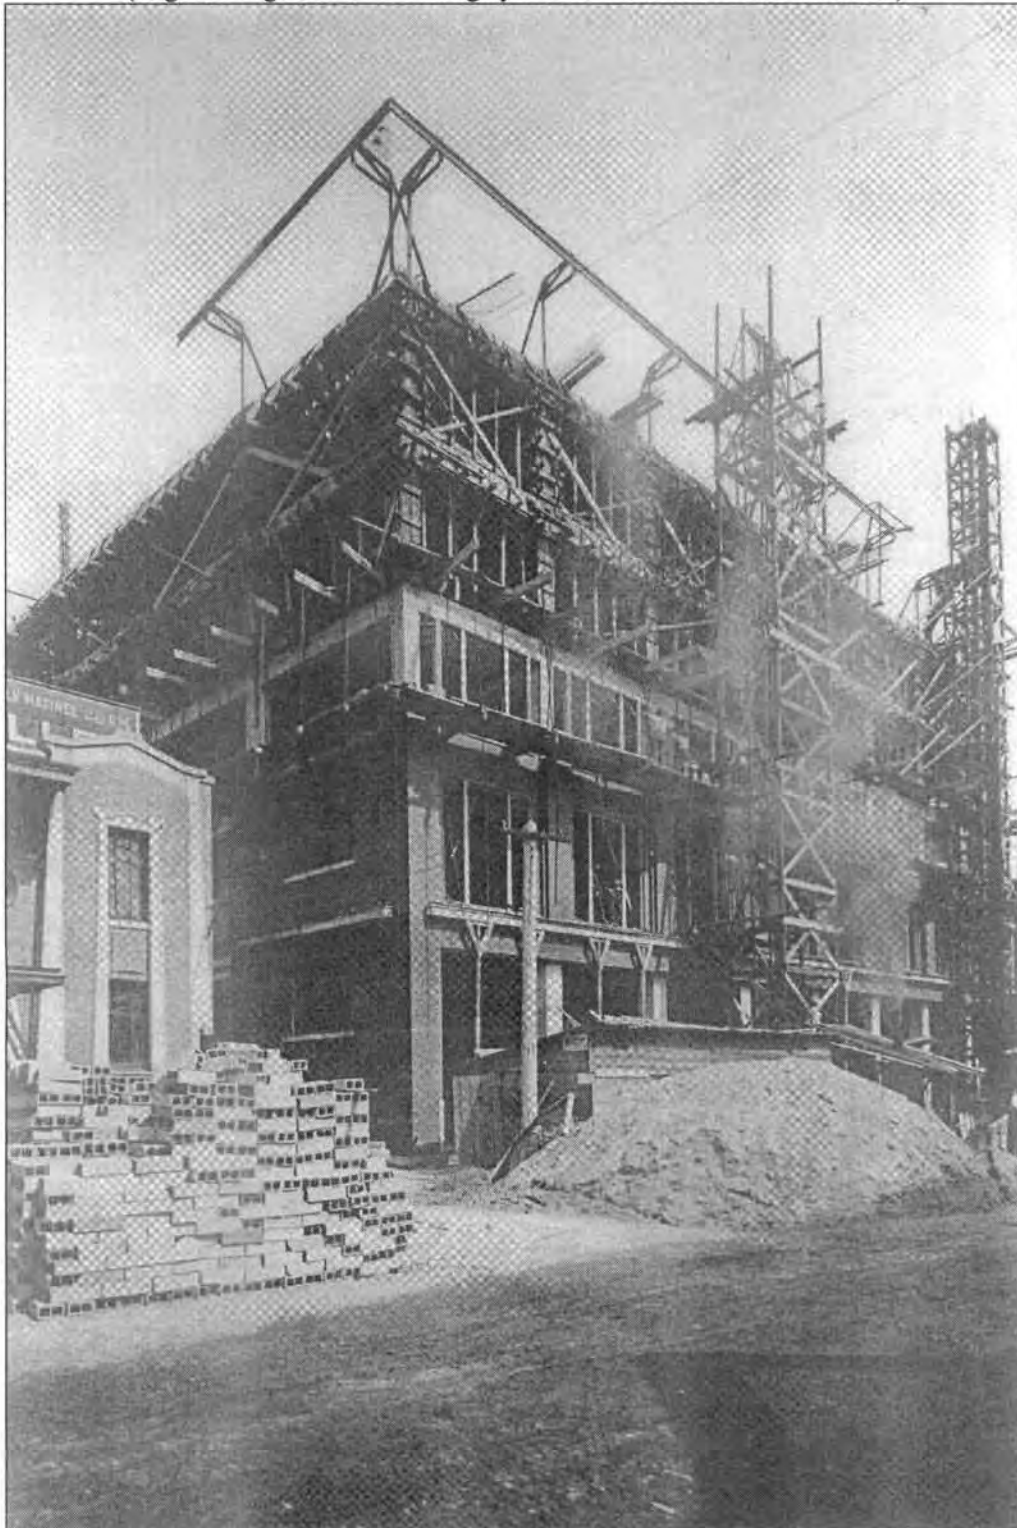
Wilkins Building construction, view southeast on 8th Street, 1908
